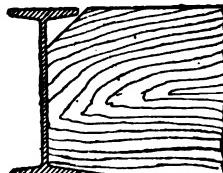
Framing Joist to I Beam. Joist Resting on Lower Flange.
